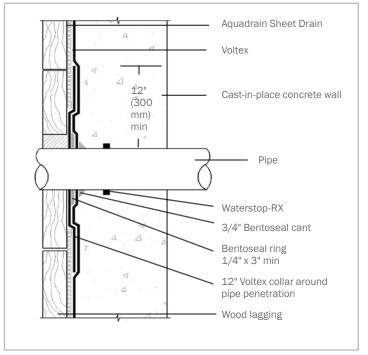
WALL PENETRATION - Cut and secure Voltex tightly around penetrations and then apply Bentoseal 3/4" (18 mm) ring around penetration and extend over membrane a minimum 3" (75 mm) radius at minimum 1/4" (6 mm) thickness.
